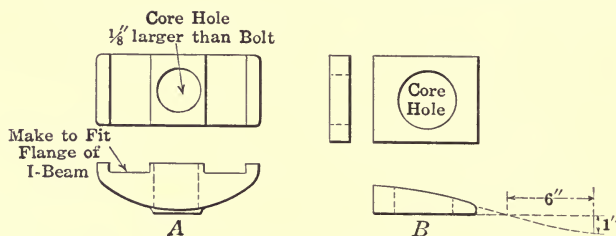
BEAM WASHERS AND FLANGE WASHER.
